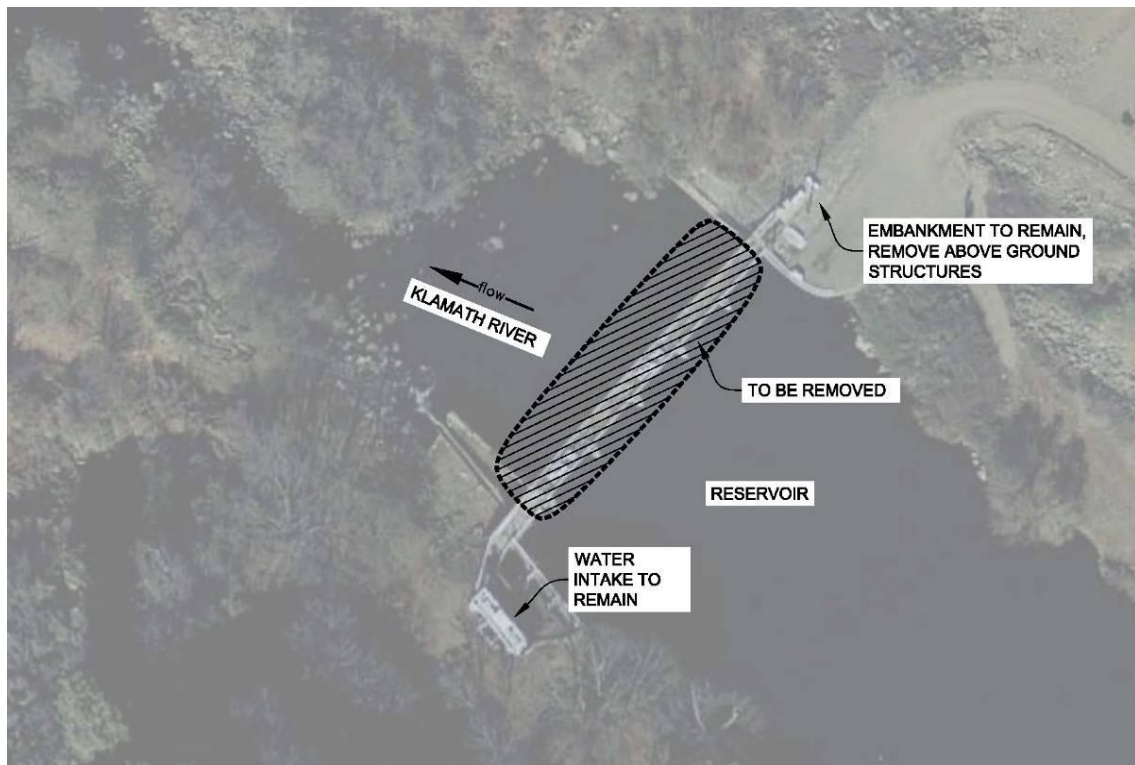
Copco 2 dam showing portion of dam to be removed for the Partial Facilities Removal Alternative
